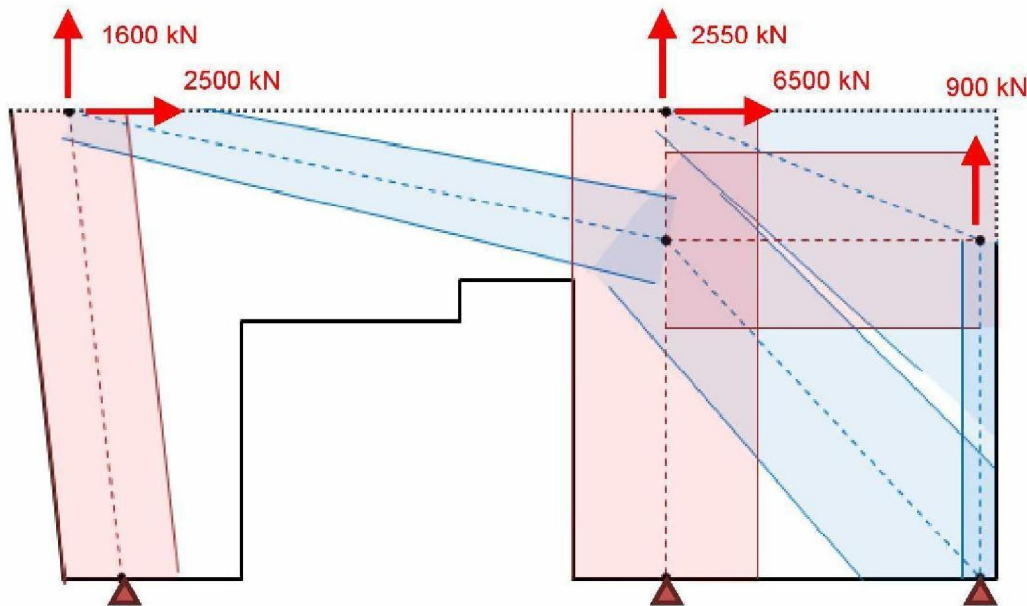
Strut (blue) and tie (red) model of wall 4, showing maximum load pattern
